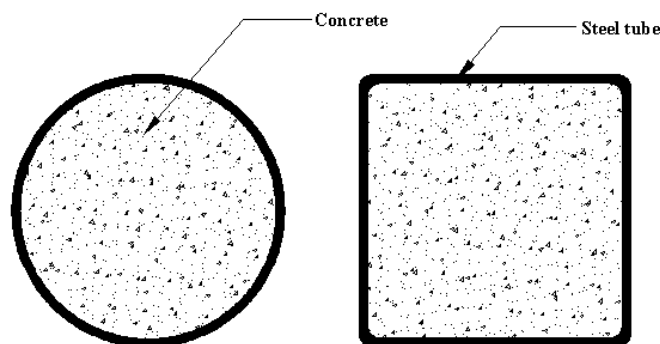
Typical Cross-Sections Of Concrete Filled Steel Tubular Sections
